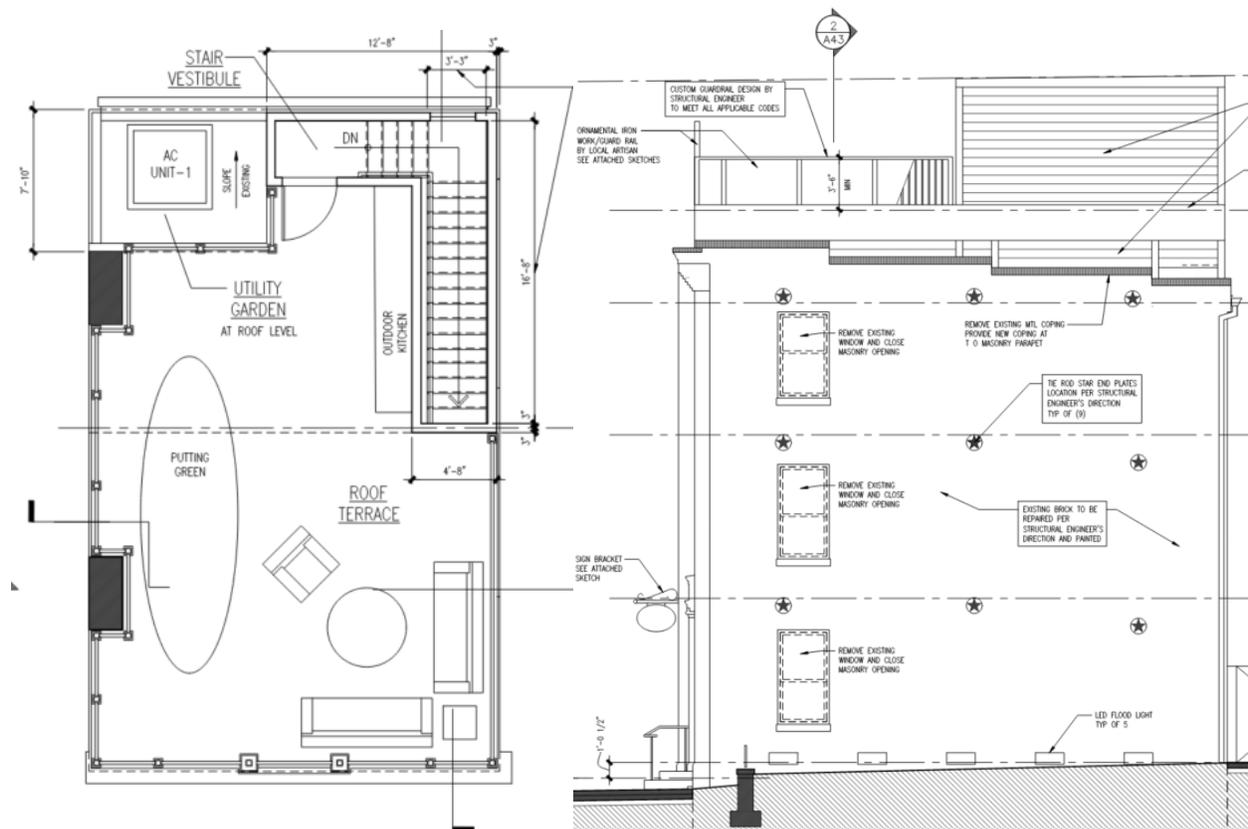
Plan and elevation showing extent of proposed roof deck and stair enclosure
